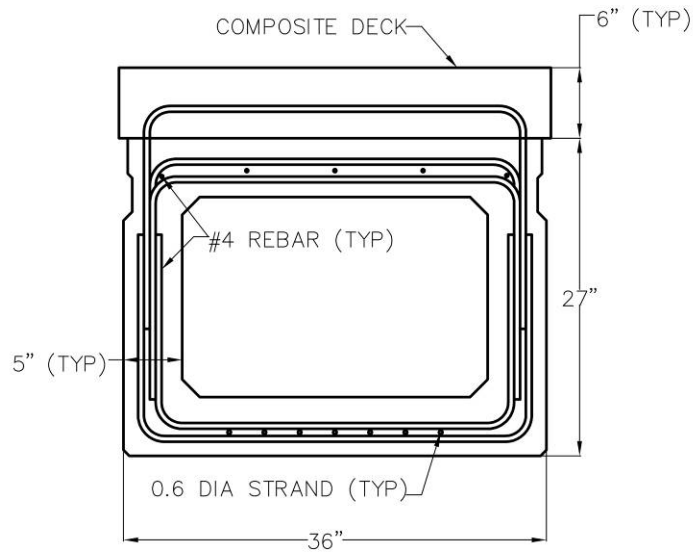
Cross-section: prestressed concrete side-by-side box-beam bridge (Example A)
